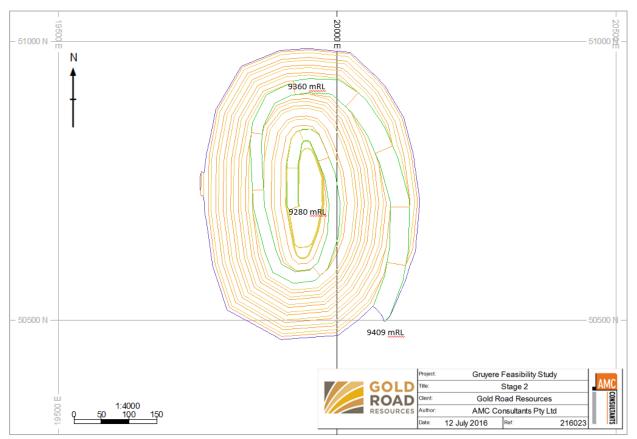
Plan View Showing Stage 2 of the Pit Design (Gruyere Grid)
